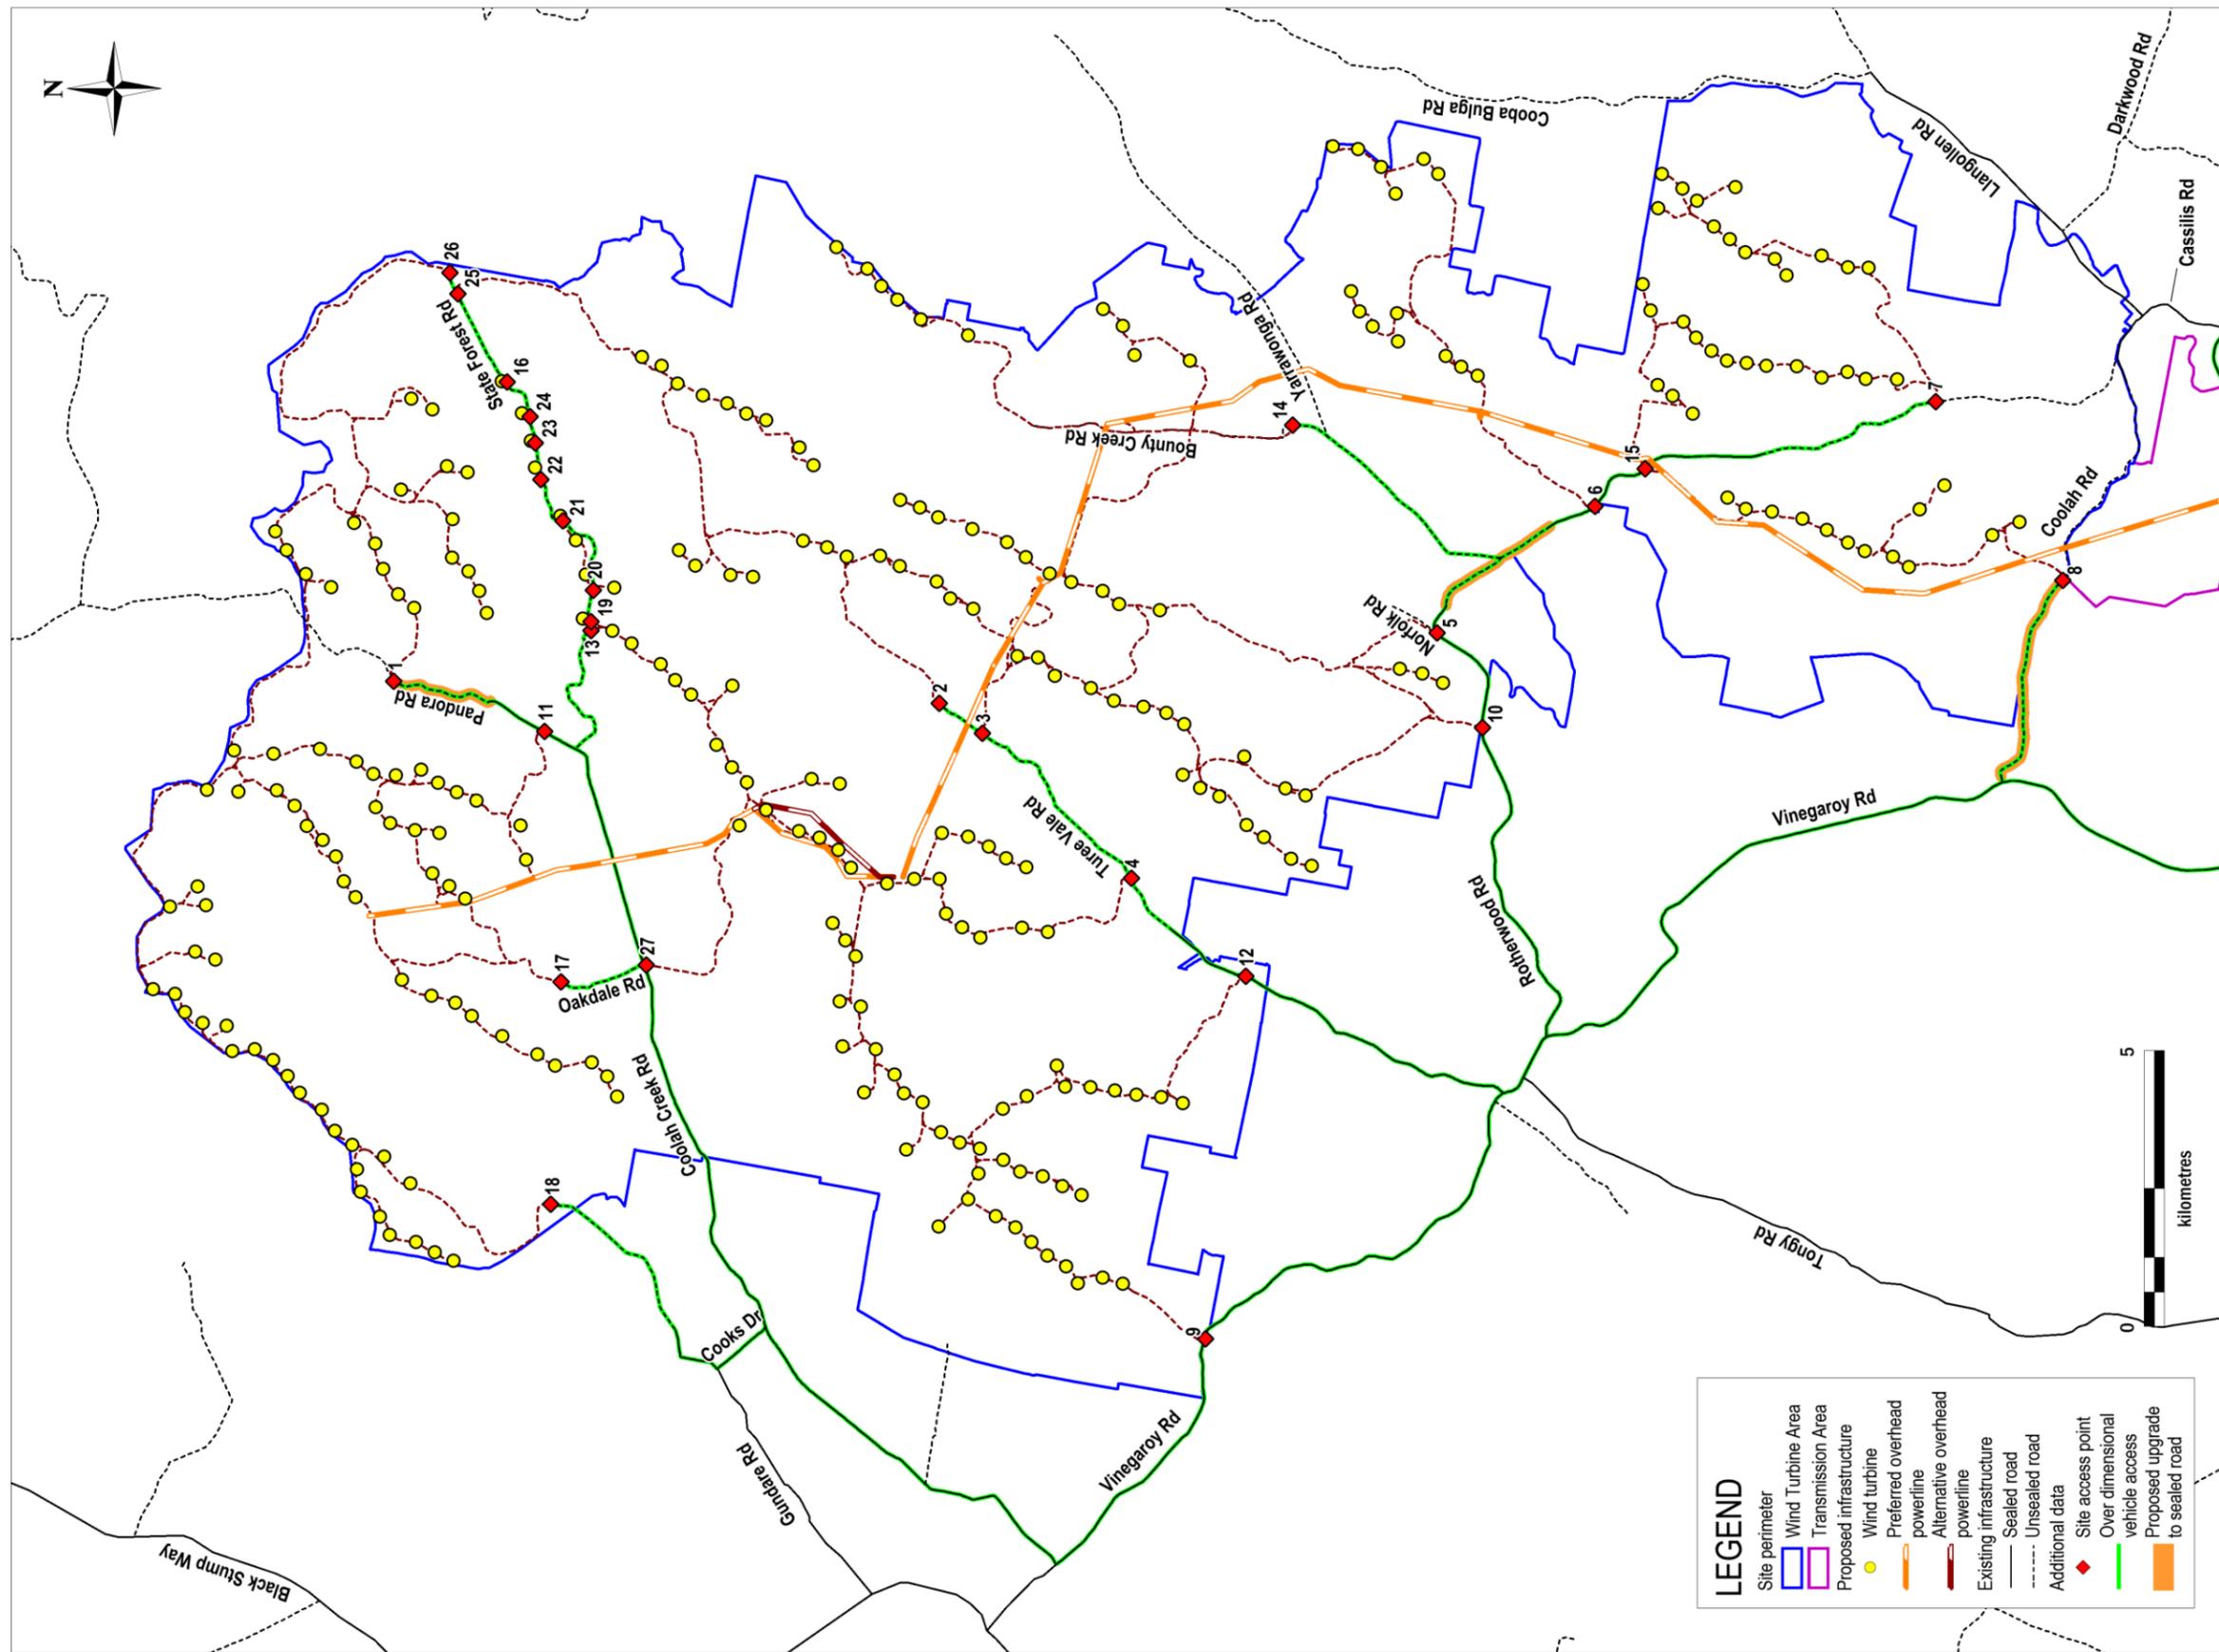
Proposed over-dimensional and over-size site access – Wind Farm Area
